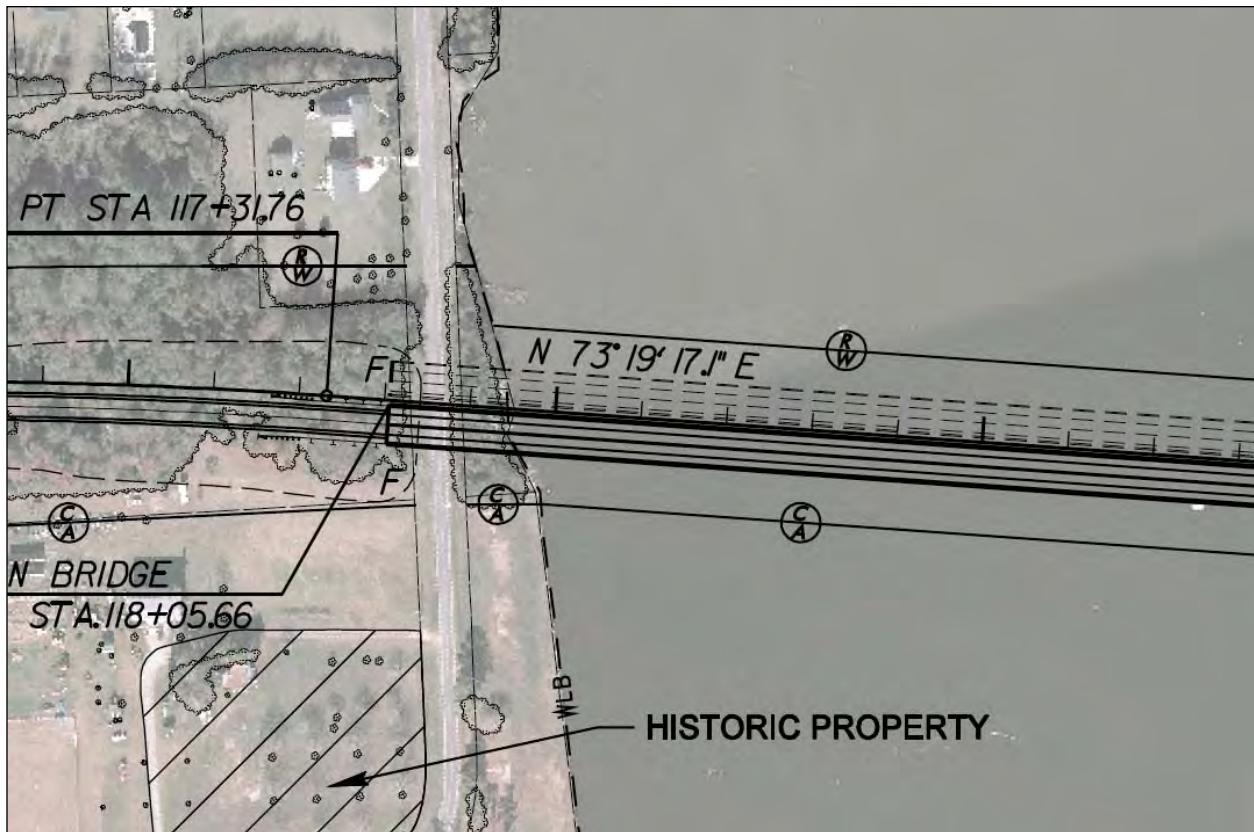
Engineering Plan excerpt of the western terminus of the bridge corridor showing location of the ROW and centerline for the bridge corridor (courtesy of Parsons Brinkerhoff).
